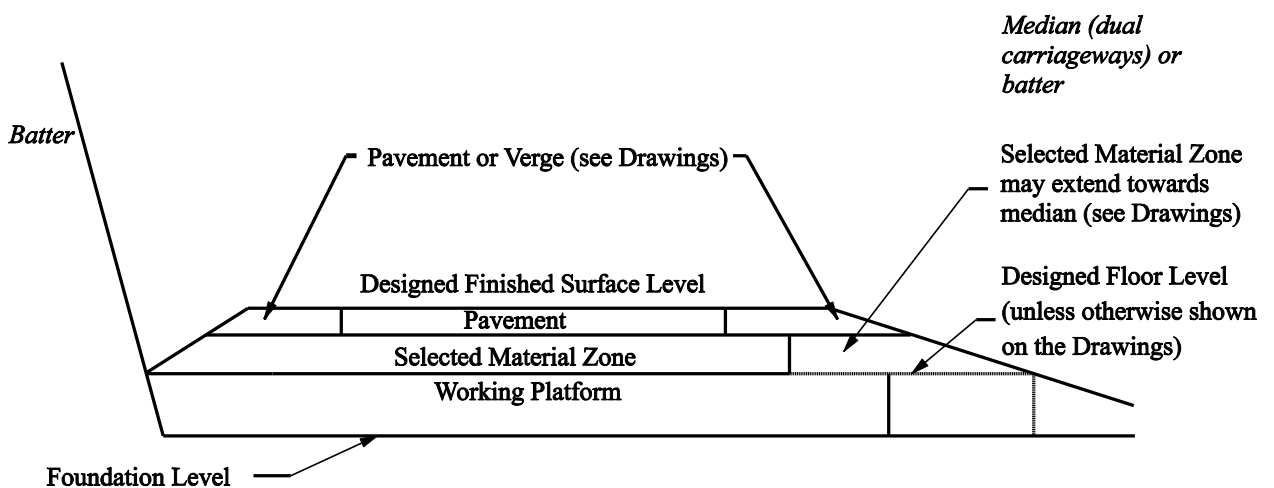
(d) – Cutting Floor Treatment – Type C4
